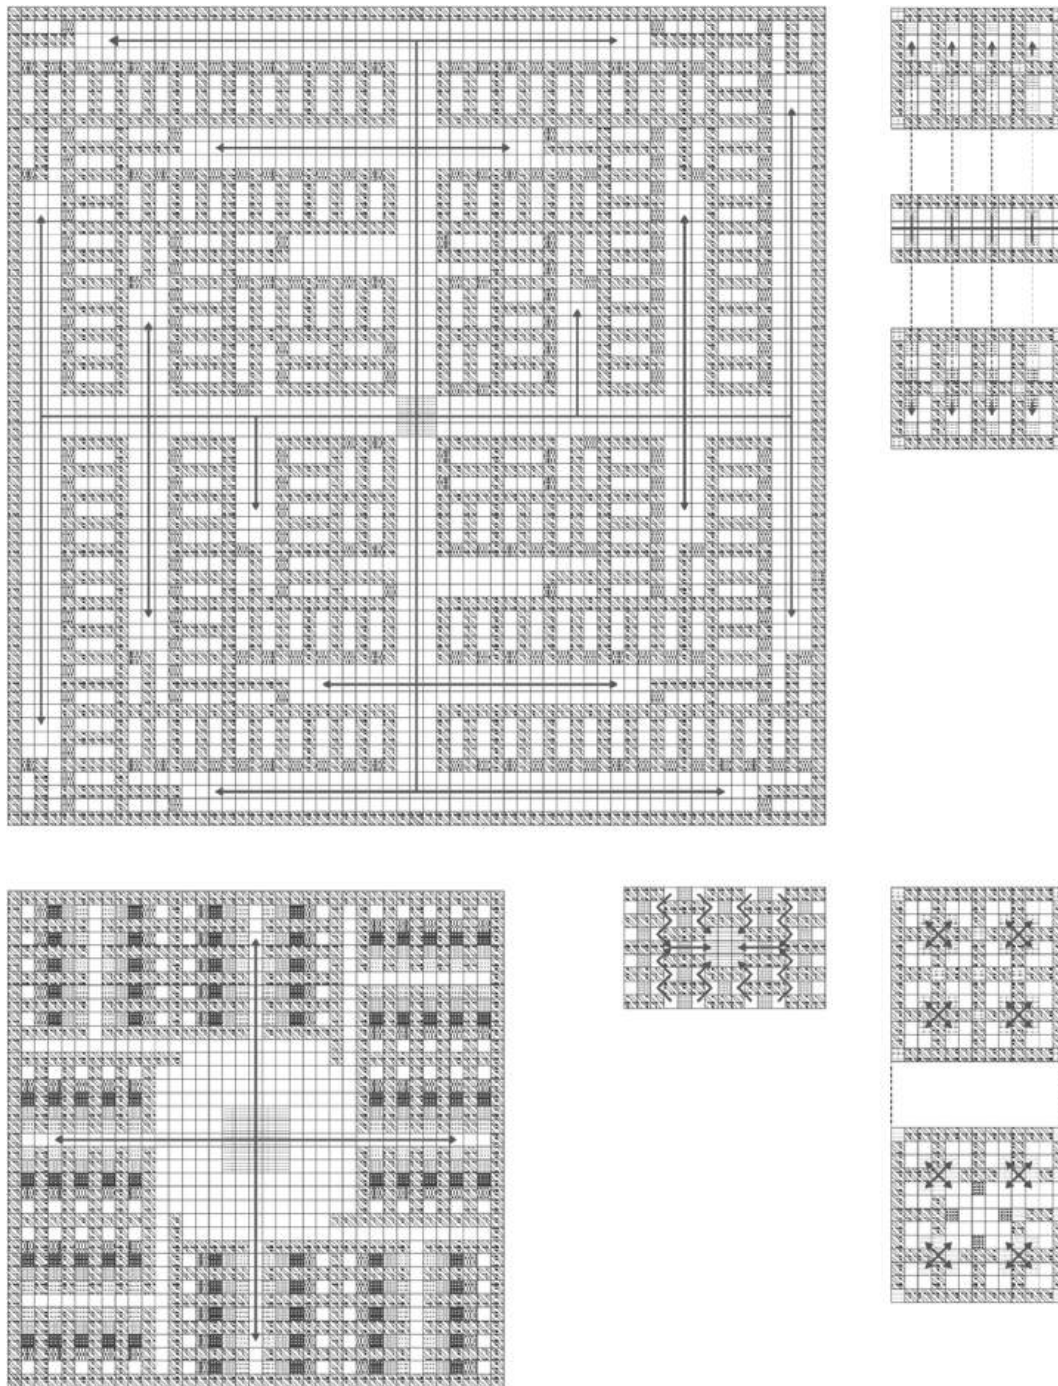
Floor plan studies of dwarven bedroom units, as detailed on Dwarf Fortress Wiki. Digital drawing, 2022, You+Pea.
